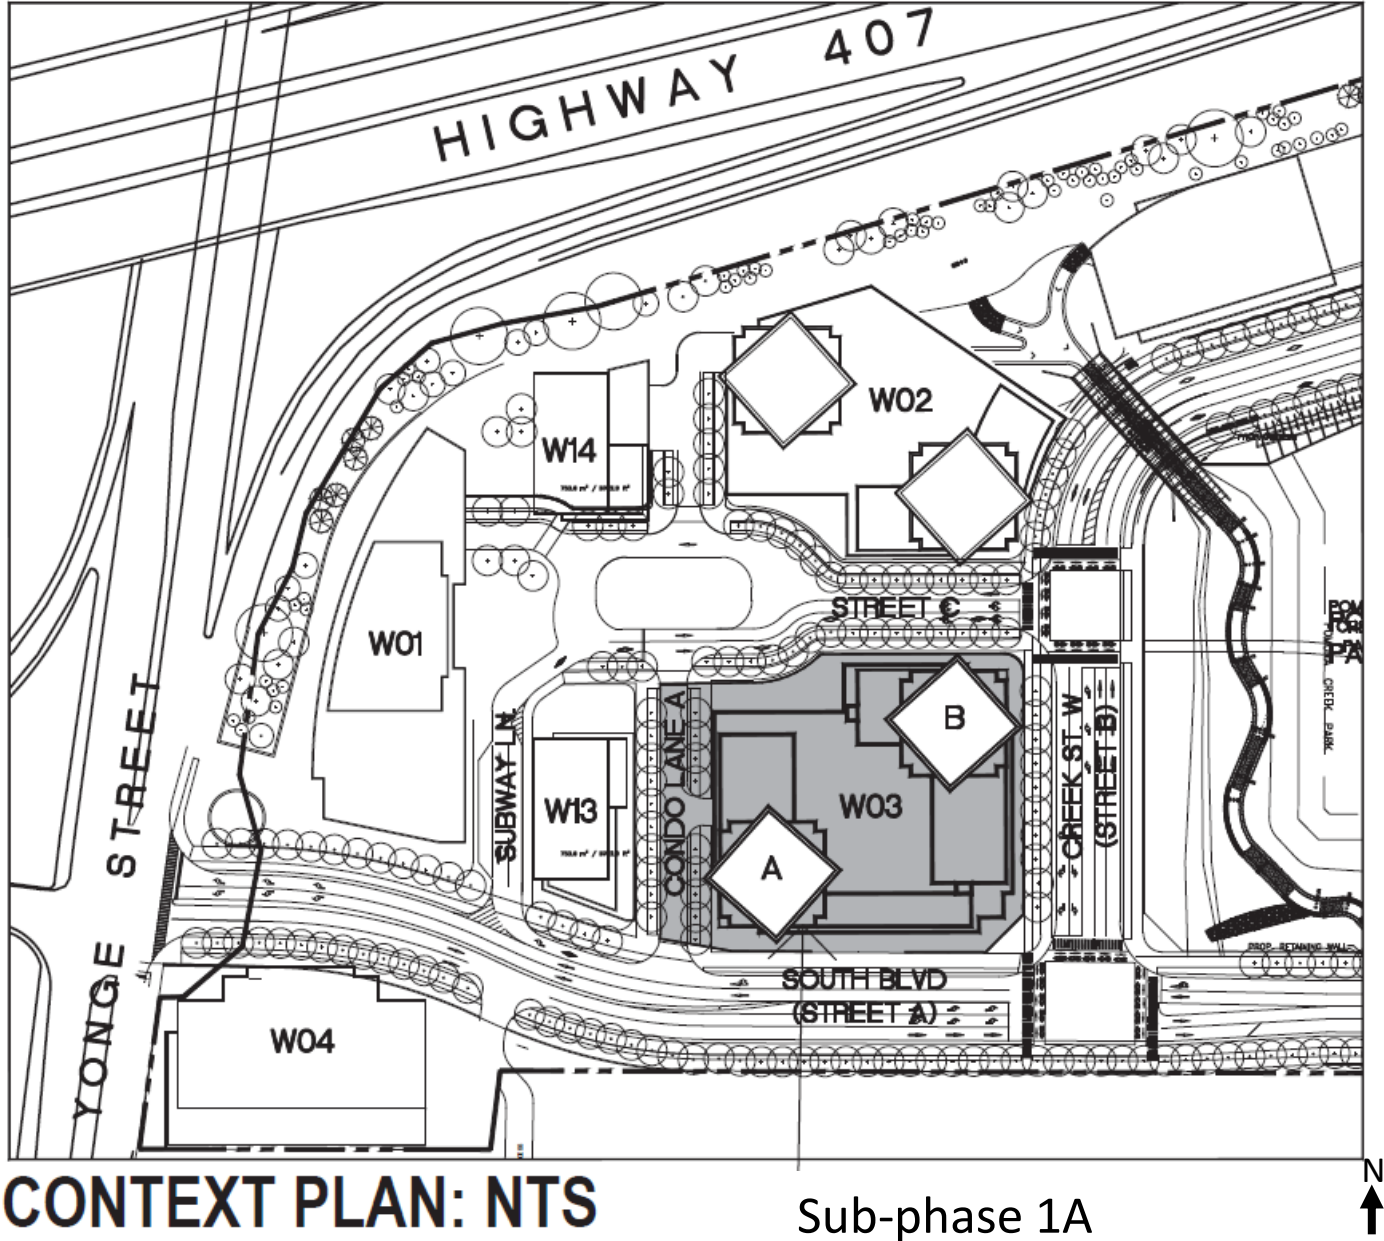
Proposed Sub-phase 1A West Precinct Plan - Context Plan in accordance with Section 11.3.1(c)
